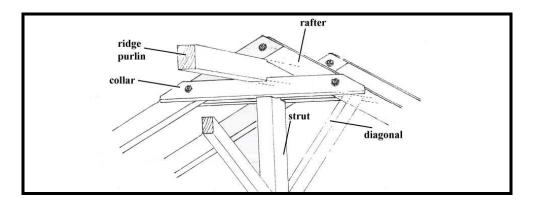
Ridge connection in a three purlin hip roof is composed of rafters, purlins, collars, struts and diagonals (Binan, 1990:82).
